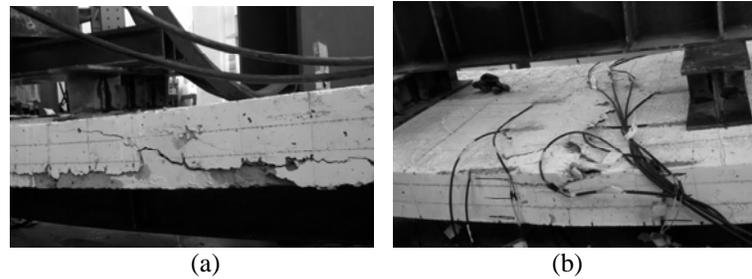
Typical failure modes: (a) diagonal shear crushing for SCB-1 with composite floor slab and (b) crushing of concrete for SCB-12 with cast-in-situ floor slab.
